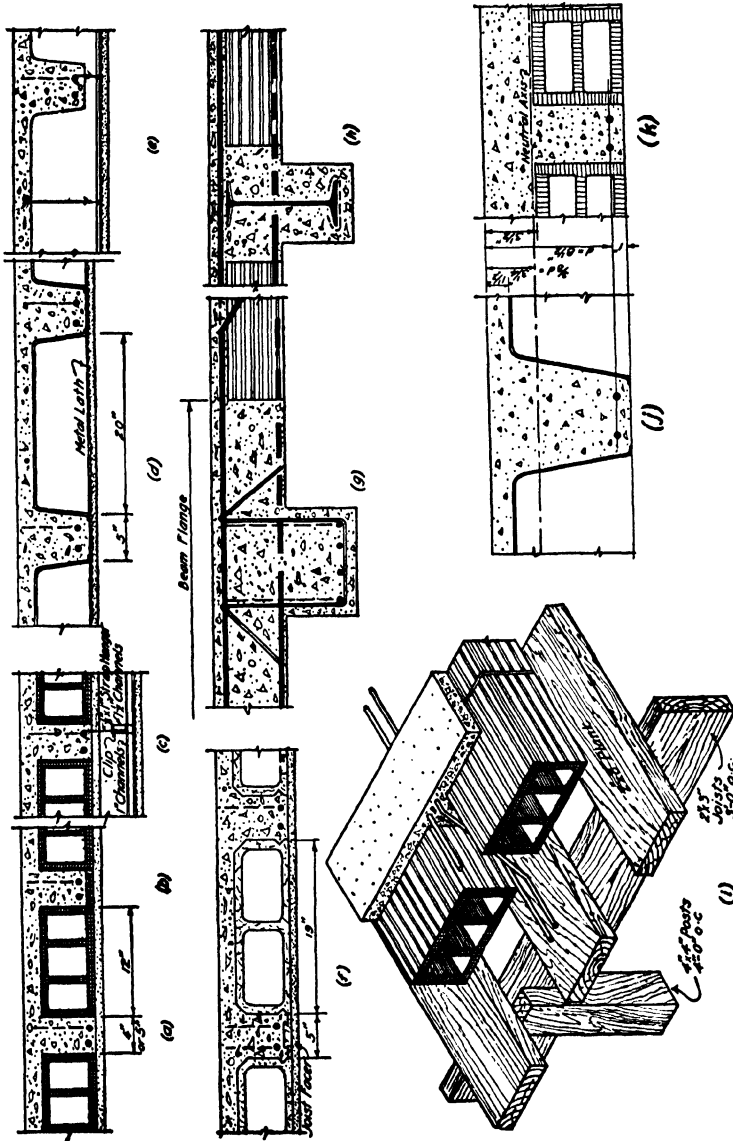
Ribbed Slab Types. (a) & (b) T.C. fillers without and with soffit block; (c) T.C. fillers with suspended ceiling; (d) pan slab, direct plaster ceiling; (e) pan slab with released suspended slab; (f) gypsum fillers, direct plastered; (g) & (h) T.C. filler slab at concrete and steel girder; (i) skeleton forms for T.C. filler slab; (j) & (k) depth relation for pan and T.C. ribbed slabs.
